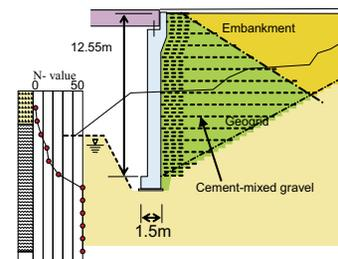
Close-section of Kyushu-Shinkansen abutment.
